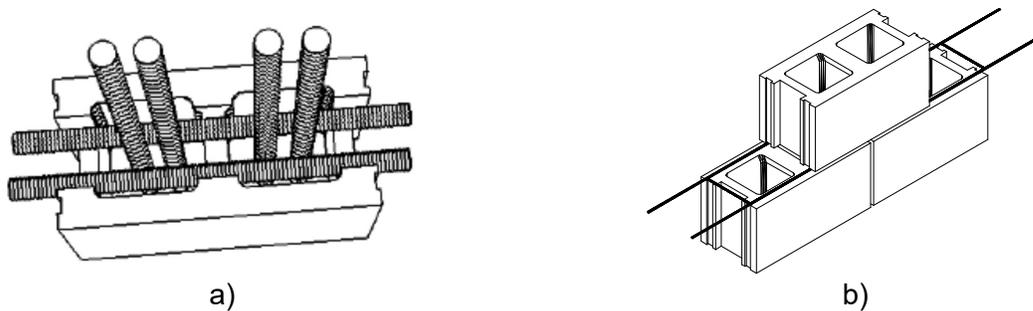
Masonry reinforcing: a) inappropriate reinforcement arrangement: 2 bars vertically and 2 bars horizontally in a 20 cm wall are almost impossible to grout, particularly at splices where the steel is doubled; b) wire joint reinforcement laid in bedjoints (Reproduced by permission of the Masonry Institute of BC).
